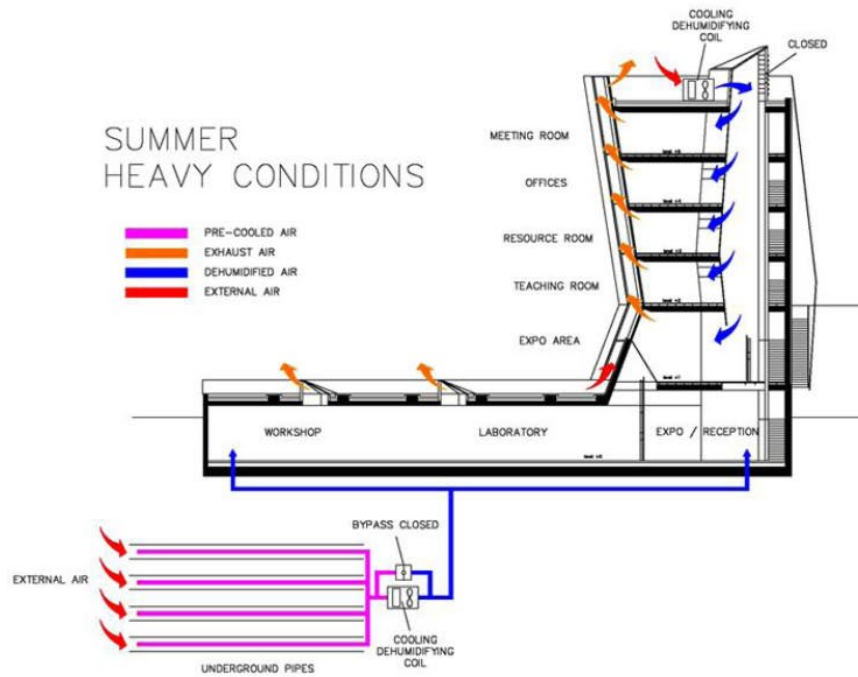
CSET building, cooling system schematic diagram (Source: Sergio, n.d.).
